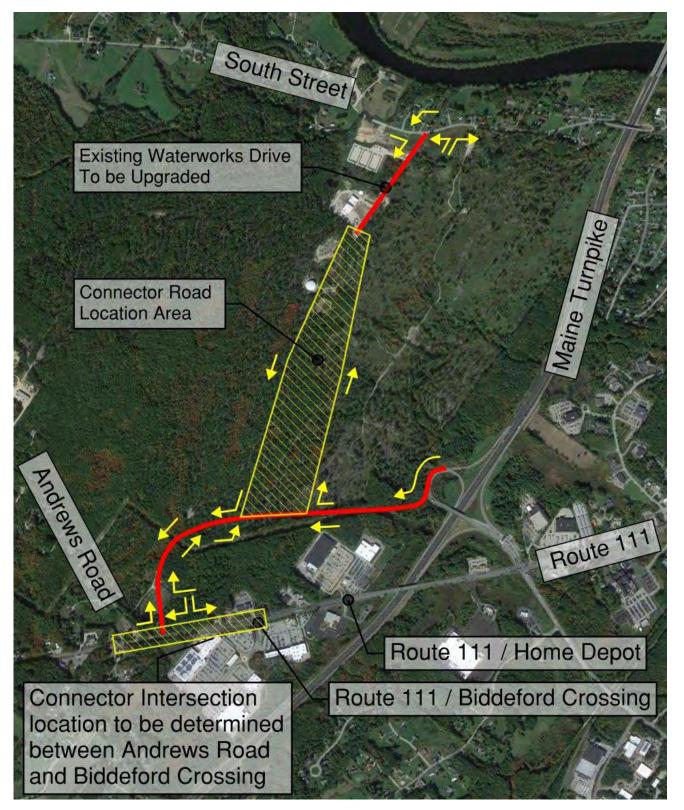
Alternative 3 South Street Connector with 2028 MTA Exit 32 Planned Improvements
